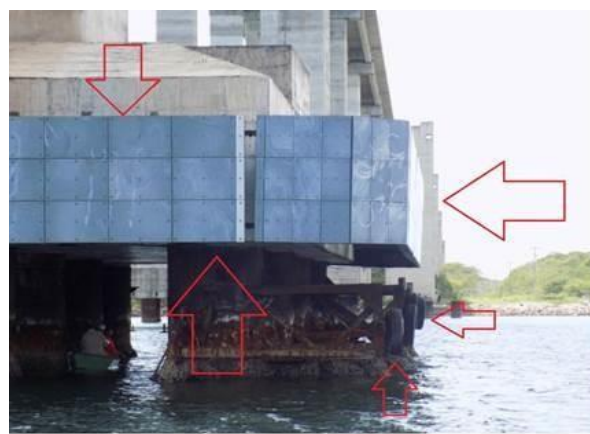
Pillars of the Newton Navarro Bridge. Source: collection of authors (2017).
